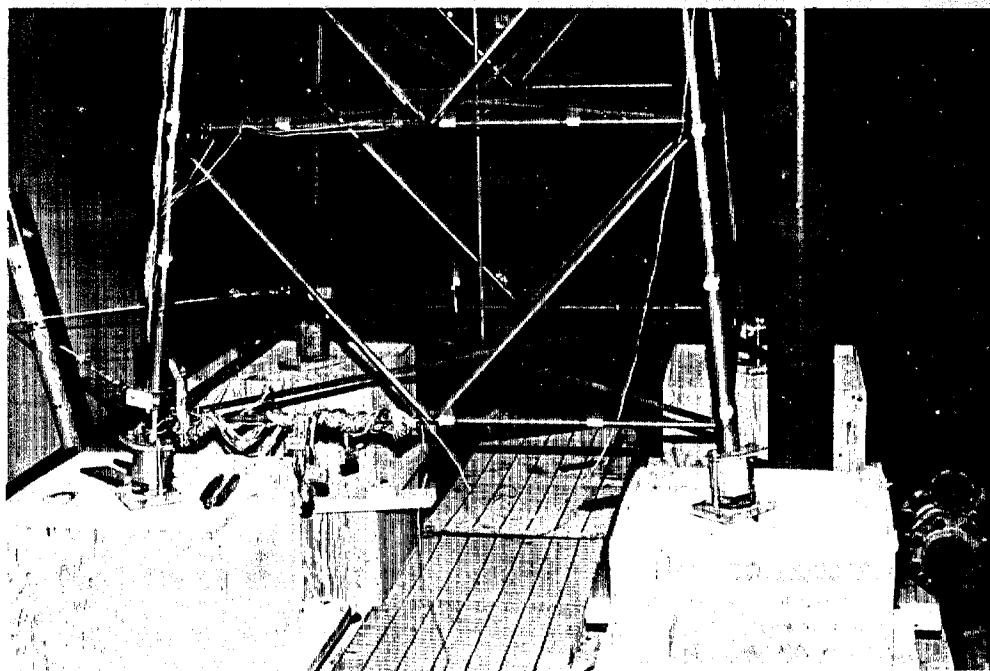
OFFSHORE PLATFORM MODEL, 1/14 SCALE, SOIL FOUNDATION CONDITION
